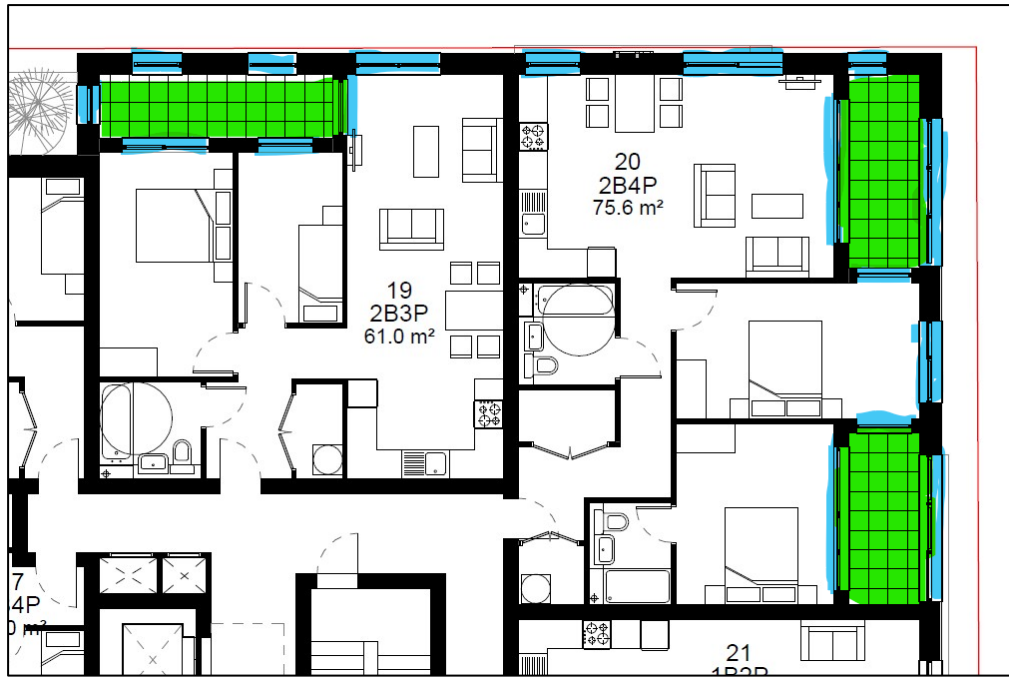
Typical floor plan showing winter gardens (green) and external and internal glazing (blue)
